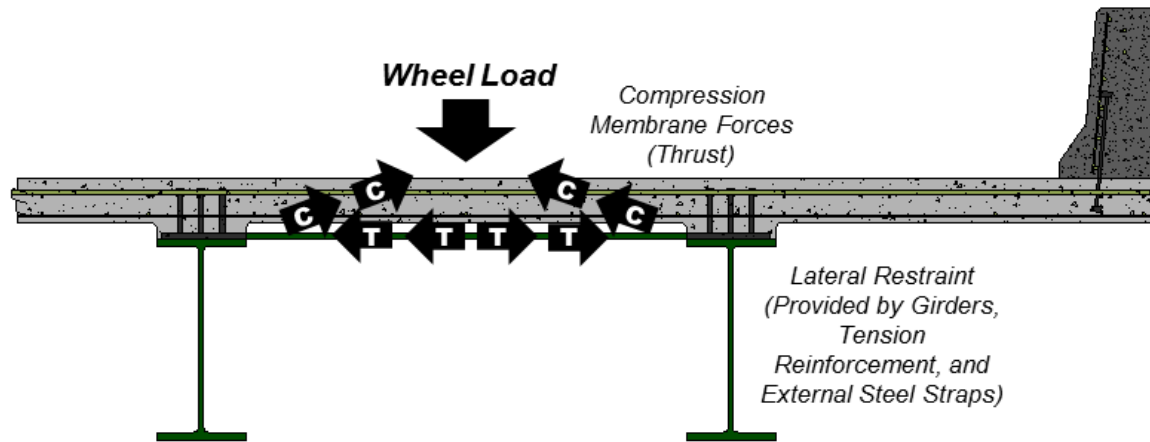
Cross-section of a steel free bridge deck illustrating compression membrane action
